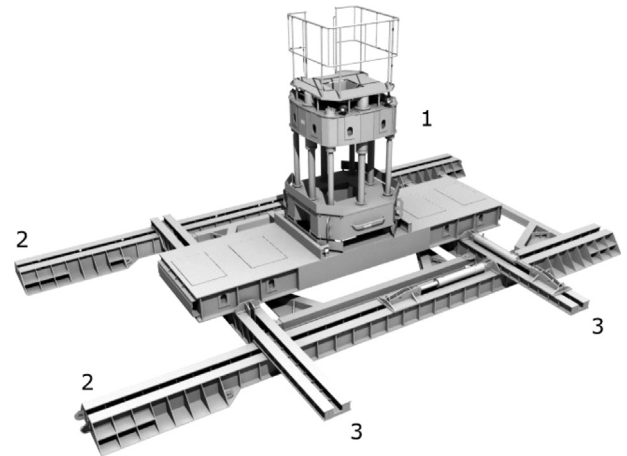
Modular section of the piling system. (1) press-in piling machine SO-450. (2) Longitudinal guides (skid tracks). (3) Transverse guides (cross slide).
